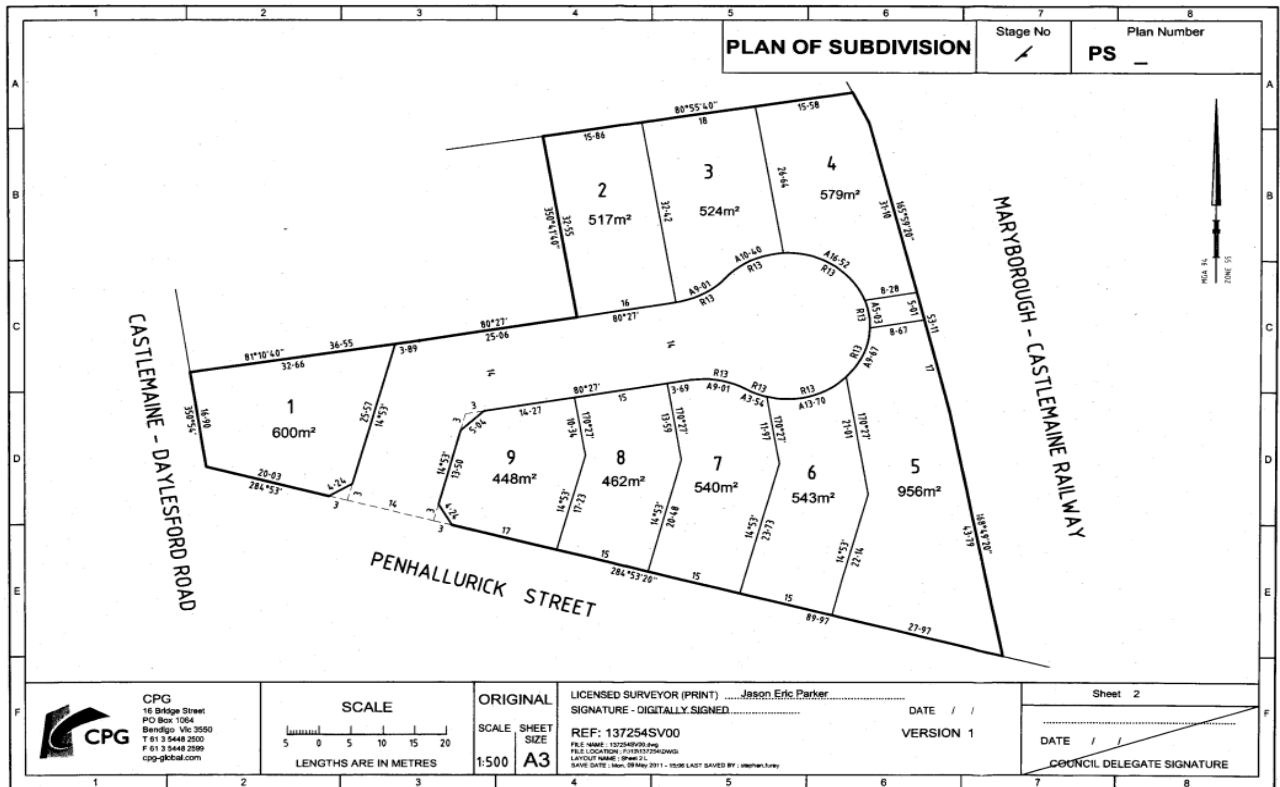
Plan of subdivision created by Planning Permit PA324/2004
